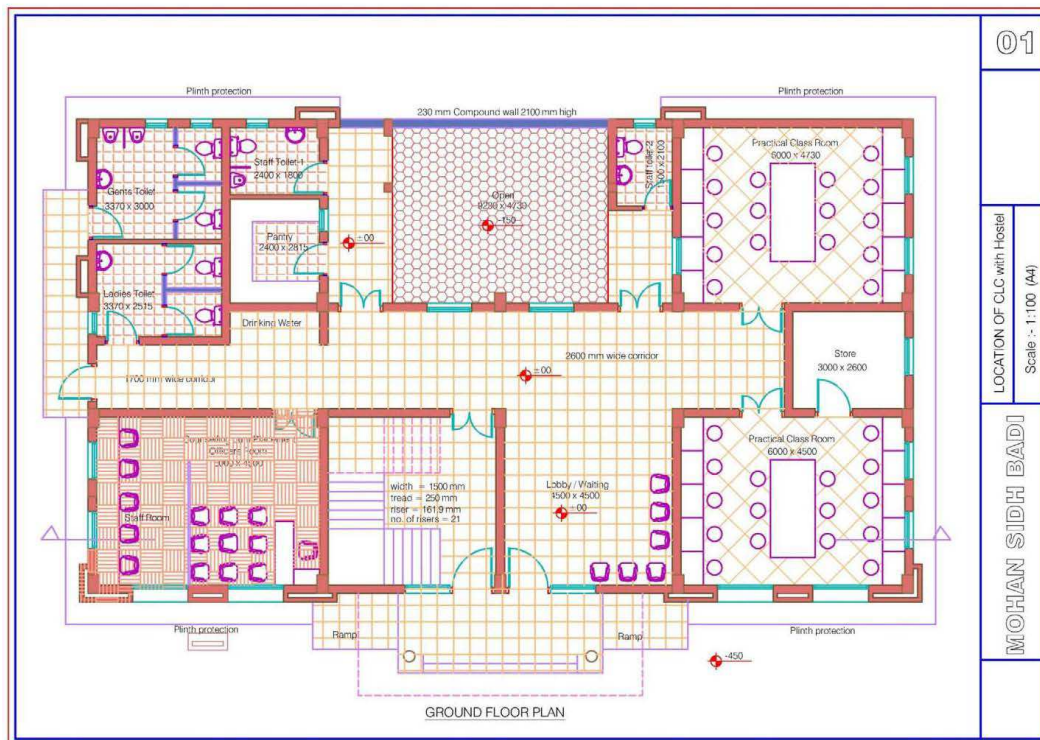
Layout Plan for RLC at Mohal Sidhbari
